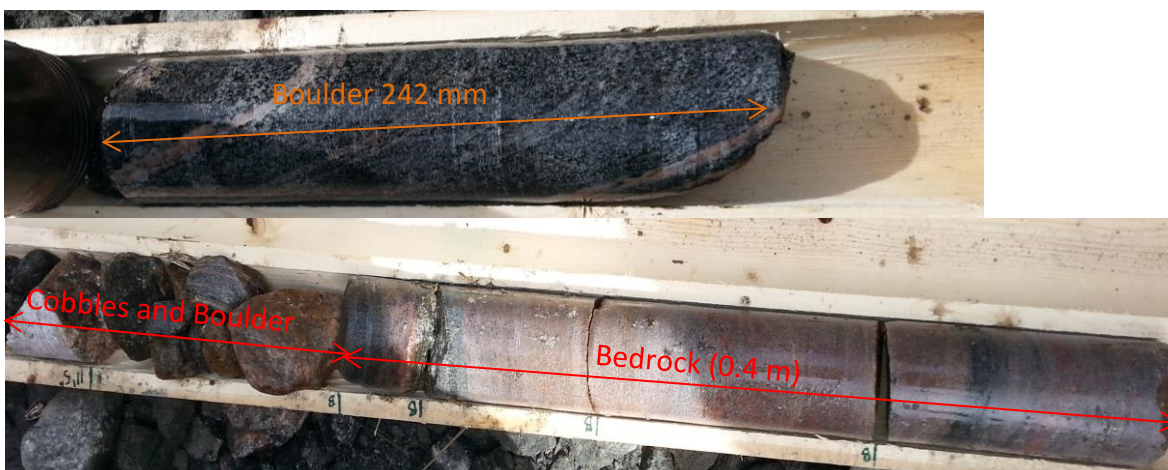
Core Sample for BH7A from Elevation 255.7 m to 253.9 m
